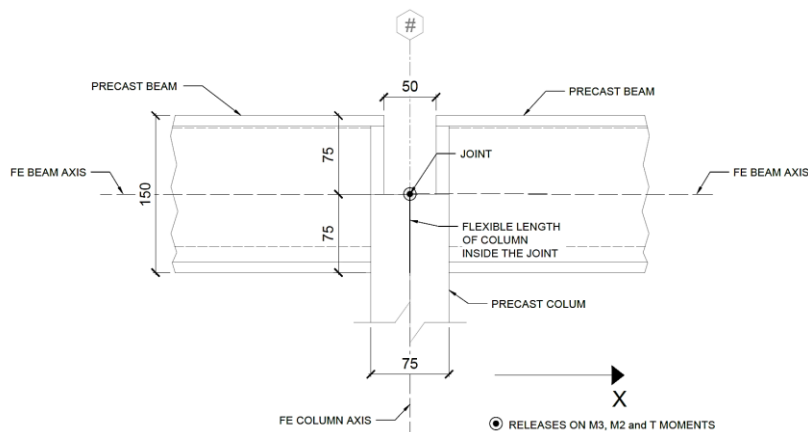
Beam-column Joint modeling scheme (units in cm).
